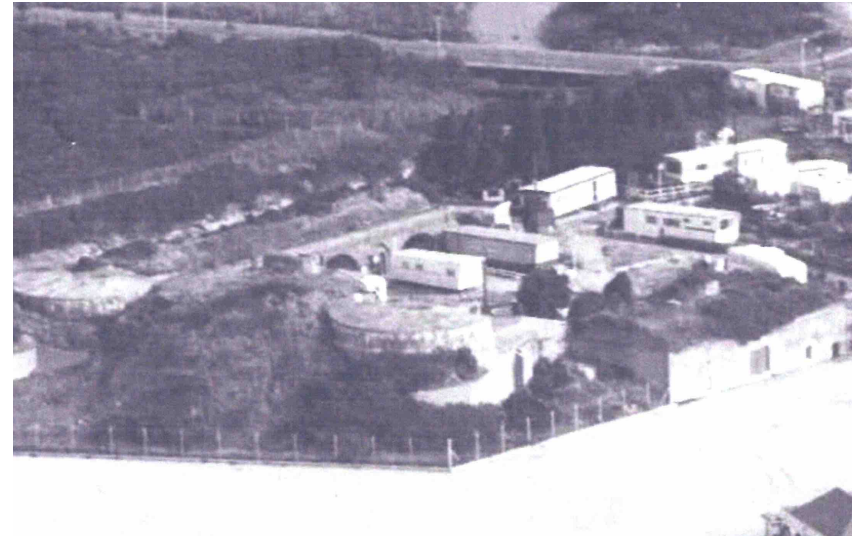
Photos of link tunnel formed before earth bank covering (c1980)
